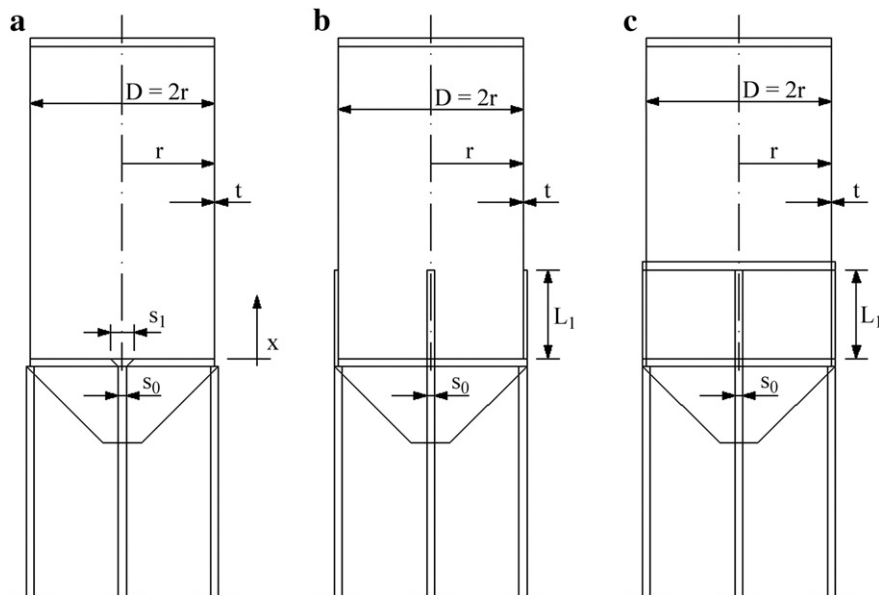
Cylindrical shells of steel silos supported by columns: a) without ribs, b) with short ribs, c) with short ribs and transition ring.
